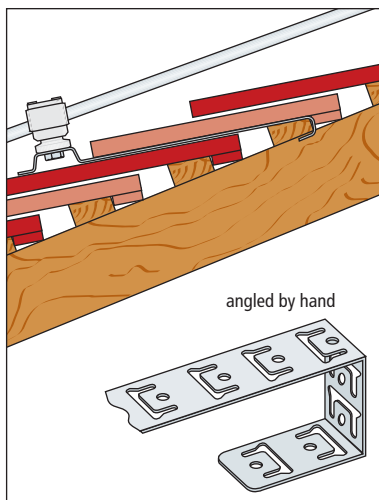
UNIsnap roof conductor holder with preformed strut – Used on grooved pantiles
